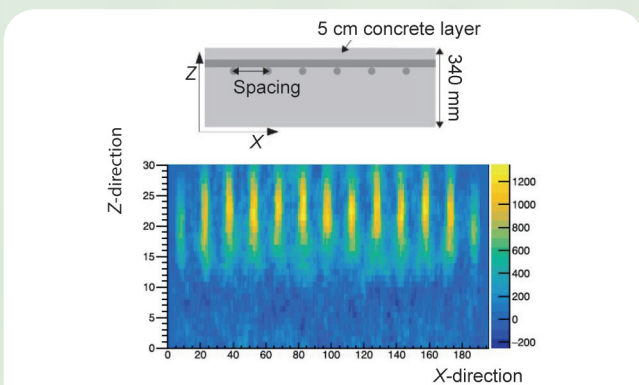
Detection and location of 6 mm rebars in 340 mm of concrete
